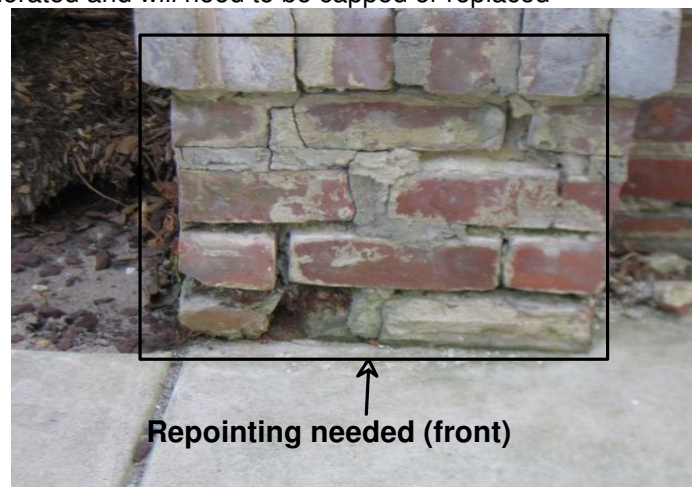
A few areas of the brick foundation wall have missing bricks and mortar requiring repair
